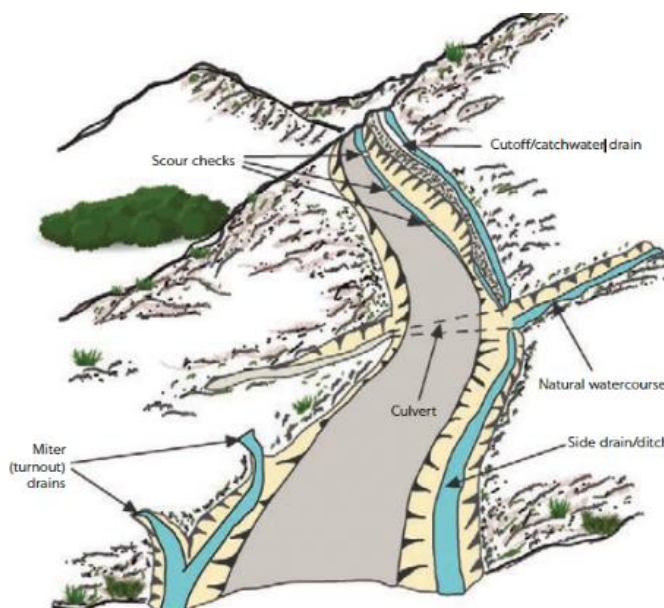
Develop road drainage system to capture run-off and feed water storage
